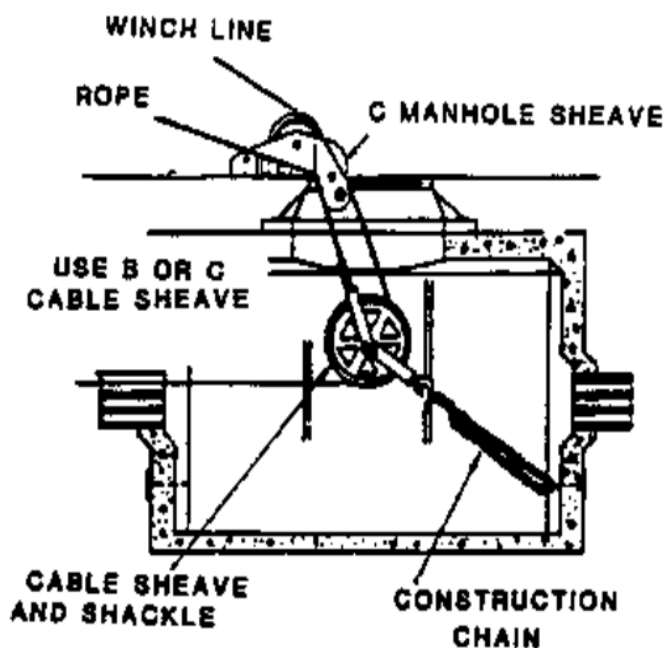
Pulling Arrangement Using C Manhole Sheave and B Cable Sheave and Shackle
